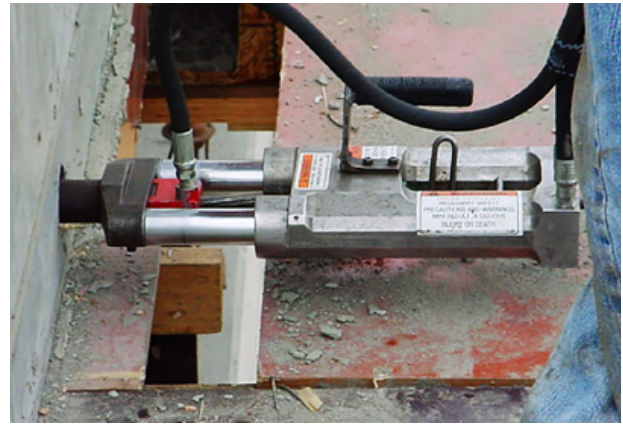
The jacks used for tensioning PT cables require a 3 ft wide accessible zone. (Image courtesy of Post-Tensioning Institute.)
